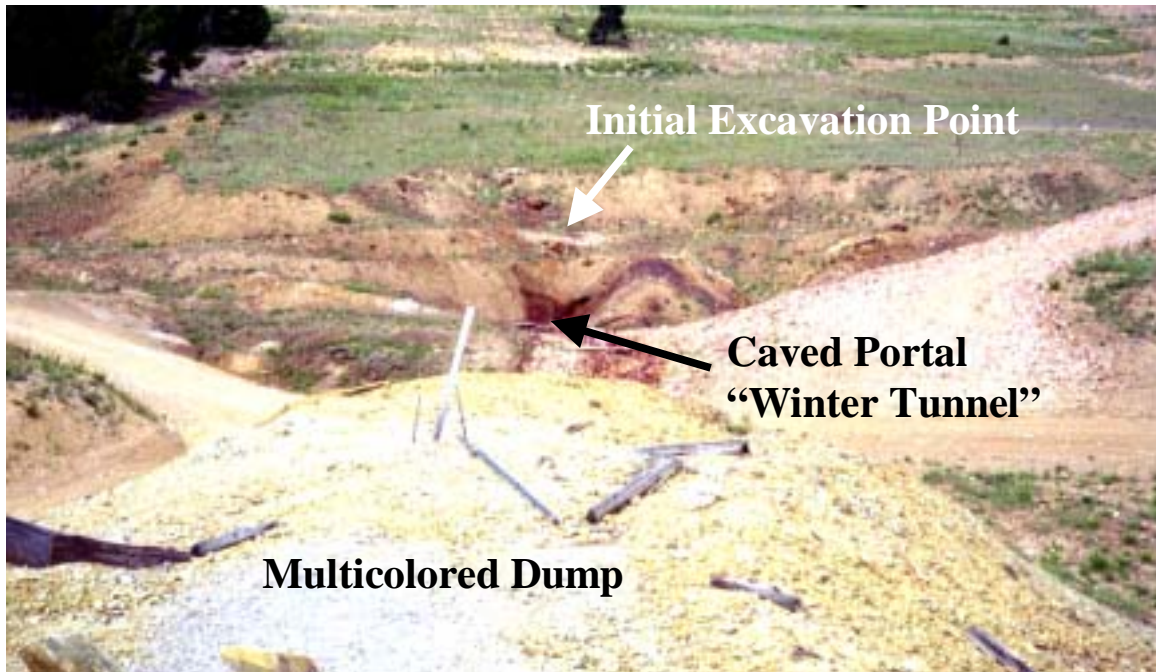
McLaren Adit or Winter tunnel prior to opening, showing collapsed portion of the portal and where excavation was begun.
